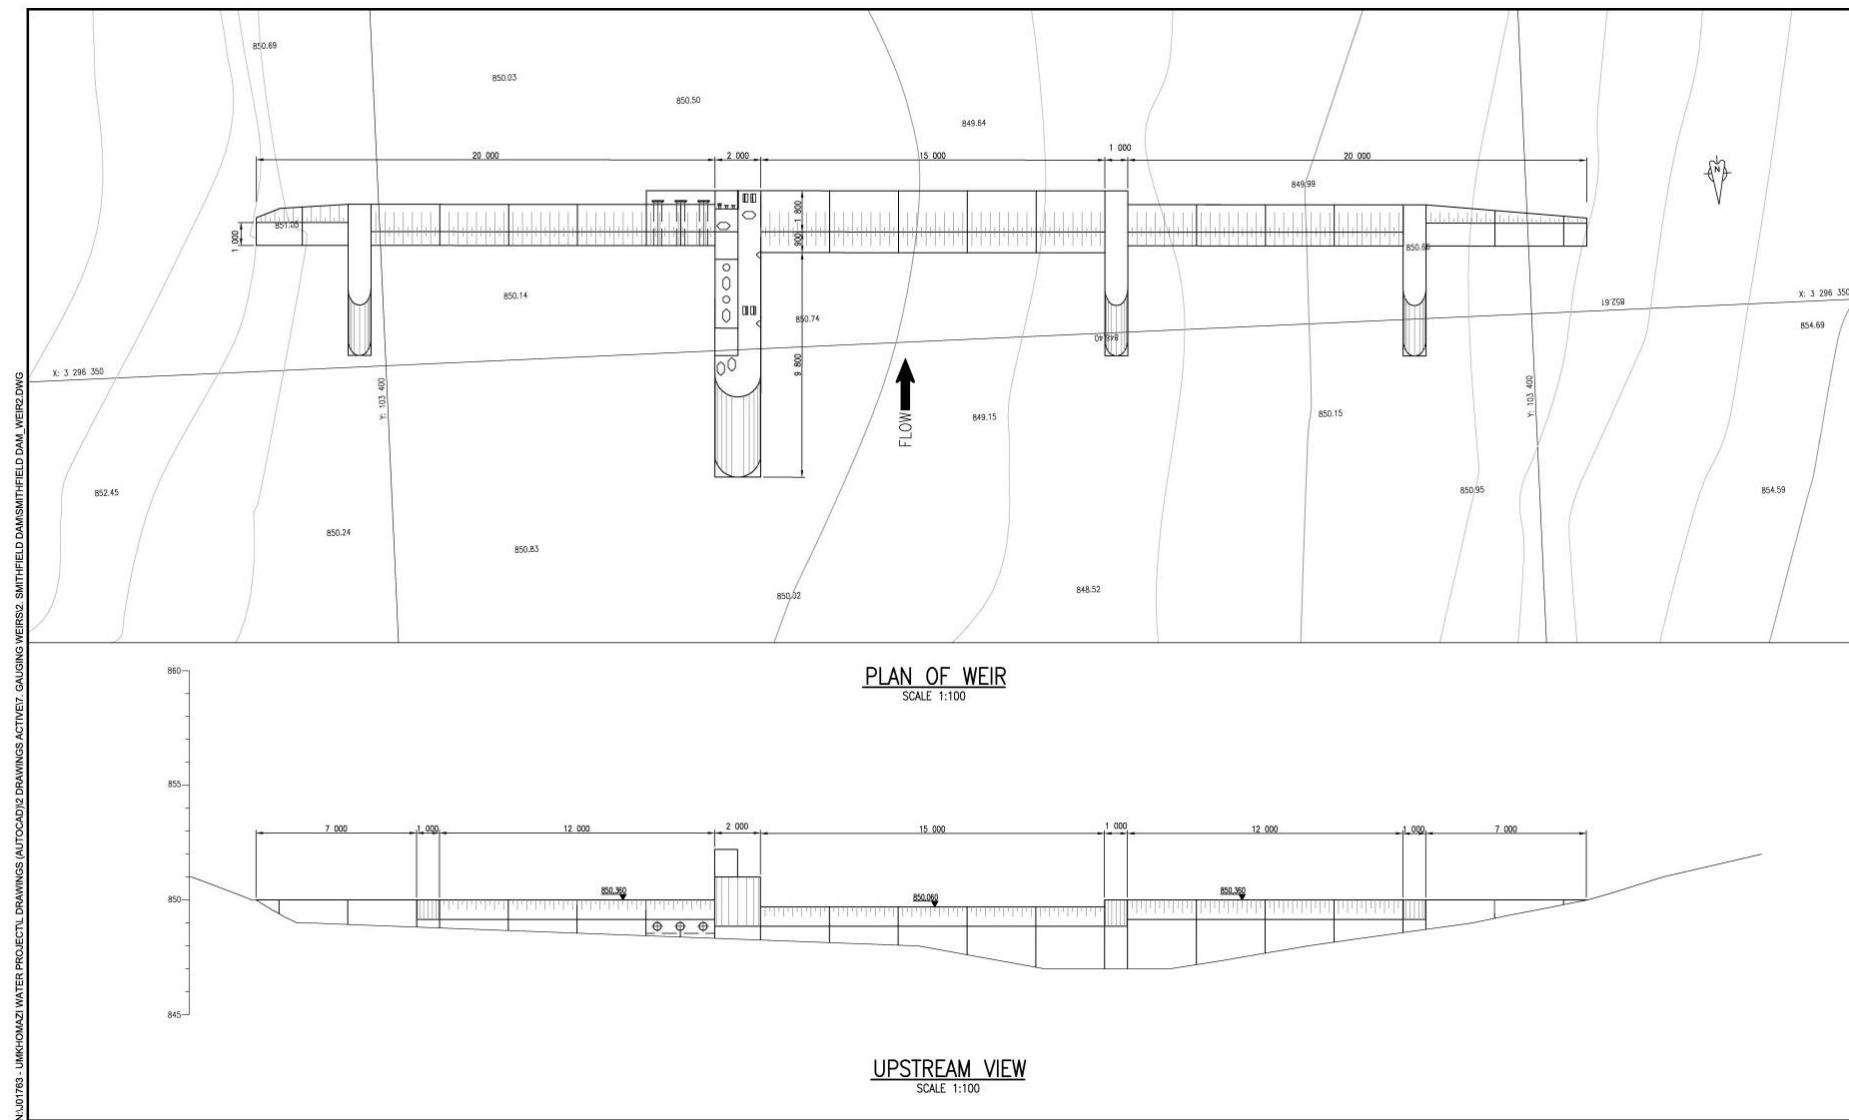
C.2: Plan and cross-sectional view of gauging weir downstream of Smithfield Dam
